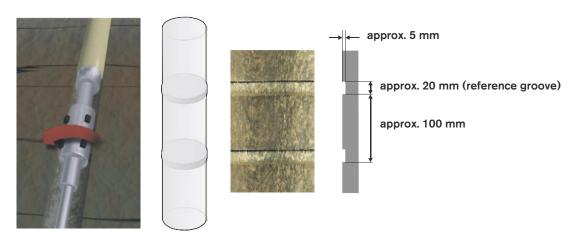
Layout and design of reference grooves. The milling tool shown to the left.
